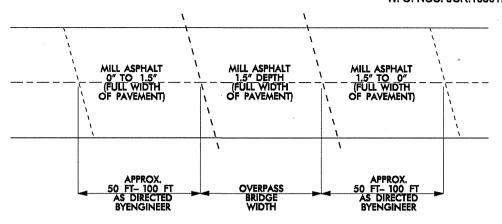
DETAIL A MILL BRIDGE DECK AND APPROACHES (SEE BRIDGE DATA SHEET (SHEET 11) FOR PAVING INSTRUCTIONS)
